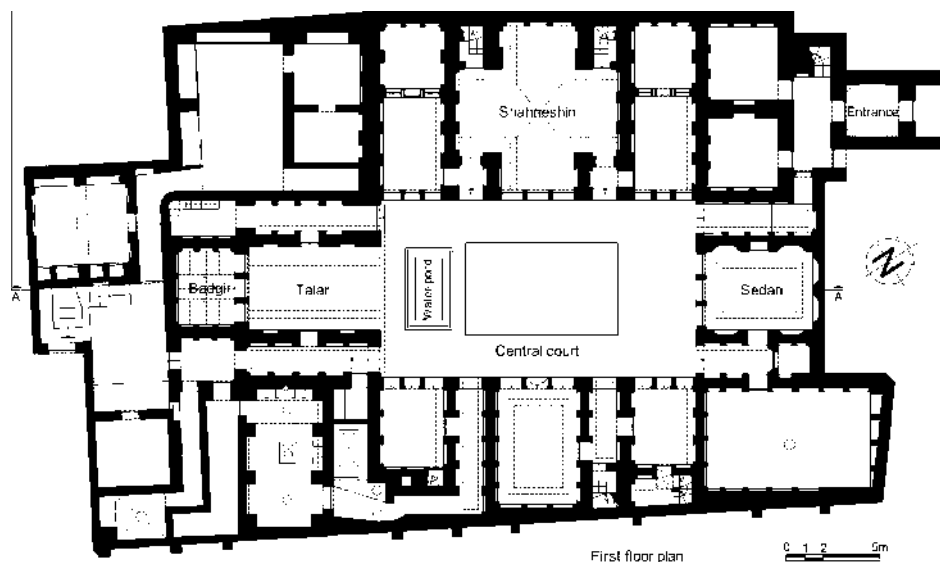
First floor plan, Tehraniha house, Yazd (after: [Haji-Qassemi \(2005\)](#)).
